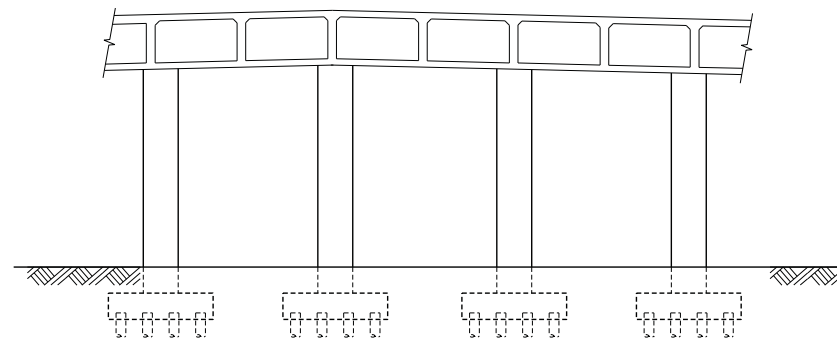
Typical Section for CIP/PS Box Girder Structure
